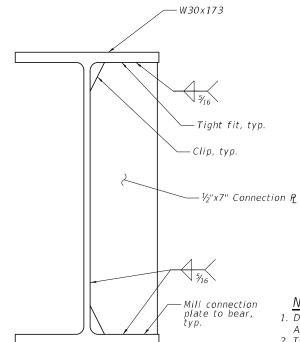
#### DETAIL A (Bearing stiffener not shown for Pier locations)
